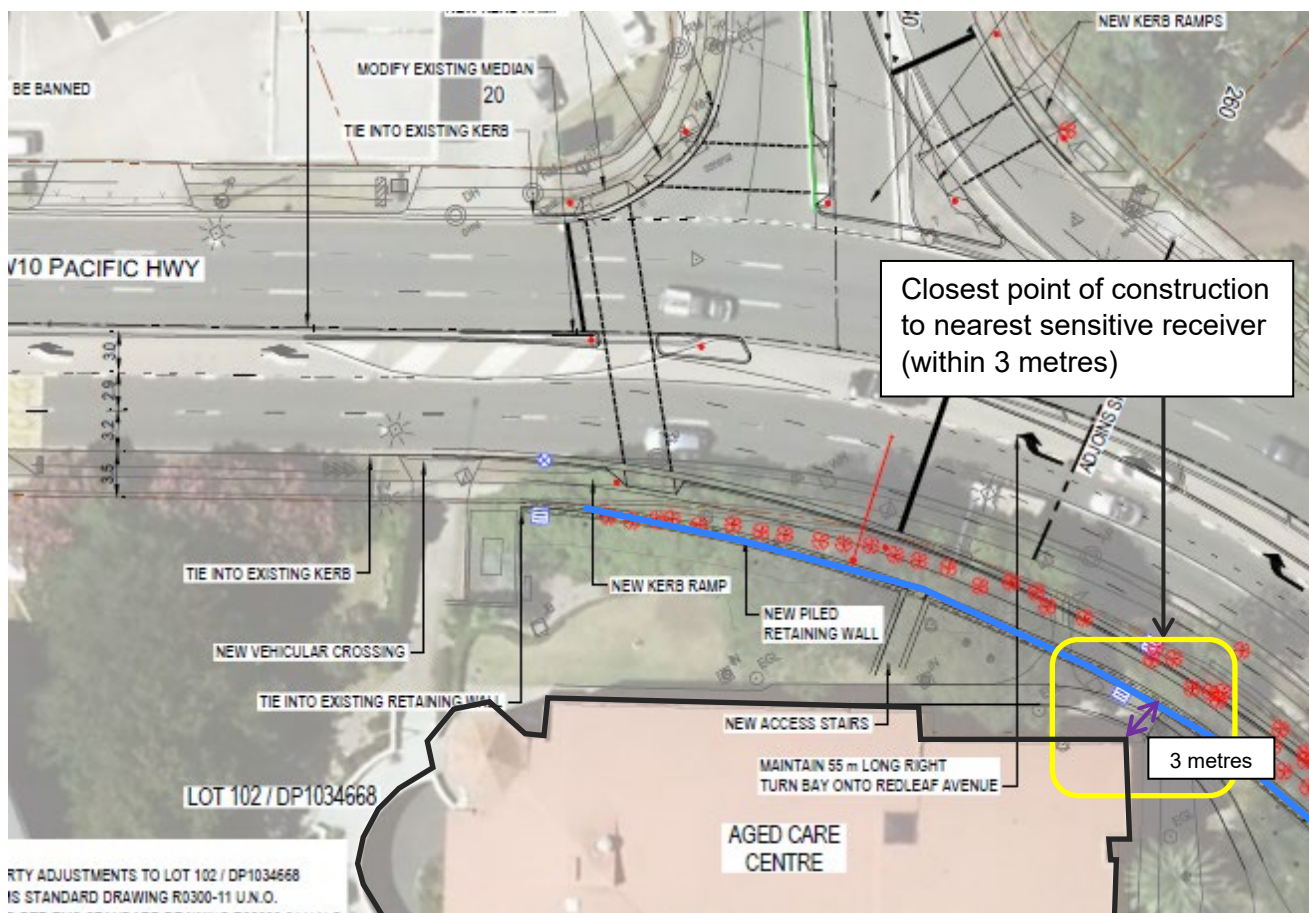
Location of the proposed retaining wall (shown in blue) and nearest sensitive receiver (an aged care facility at 1614-1634 Pacific Highway)
